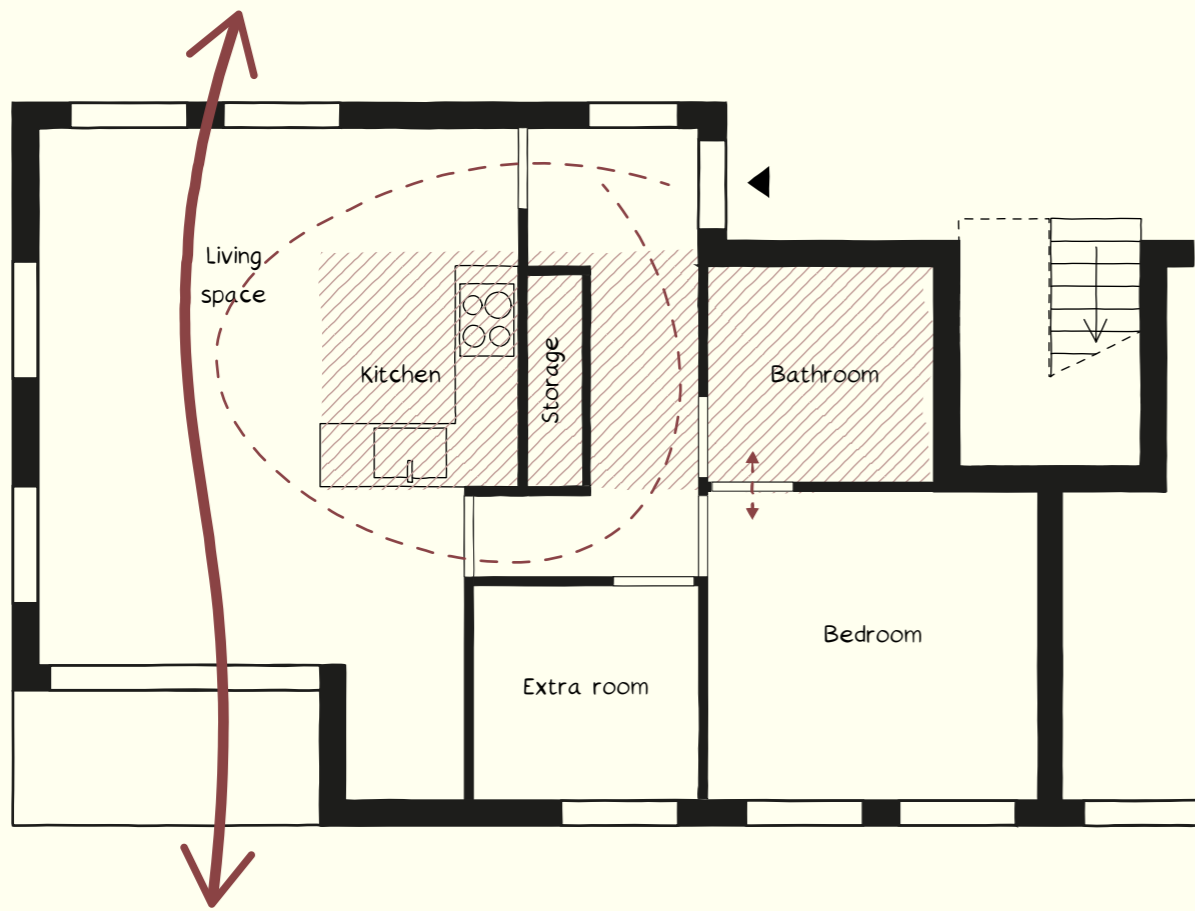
Conceptual floor plan of a gallery-access apartment (own figure)
